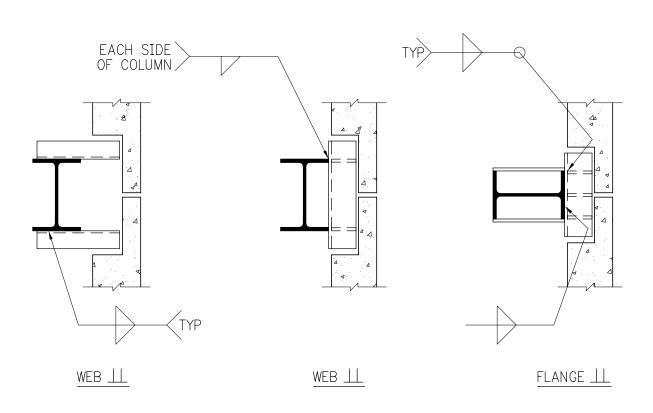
PRECAST CONCRETE ENGINEERING ISSUES - CASE B
